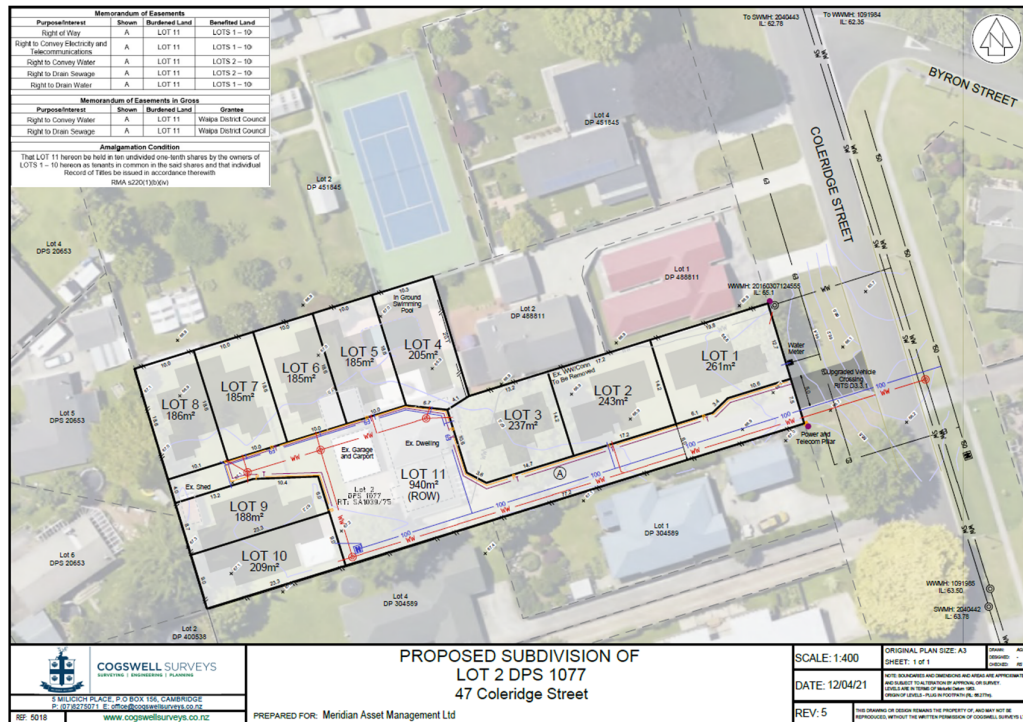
PROPOSED SCHEME PLAN – 12 APRIL 2021
